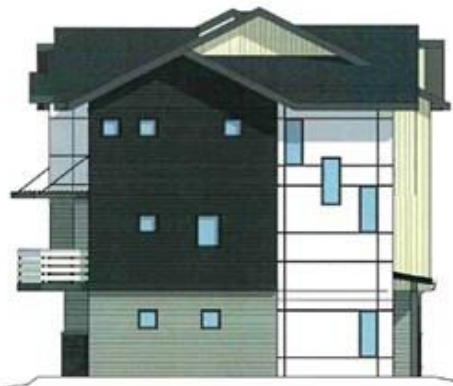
EXHIBIT "D" – PROPOSED BUILDING MATERIALS
